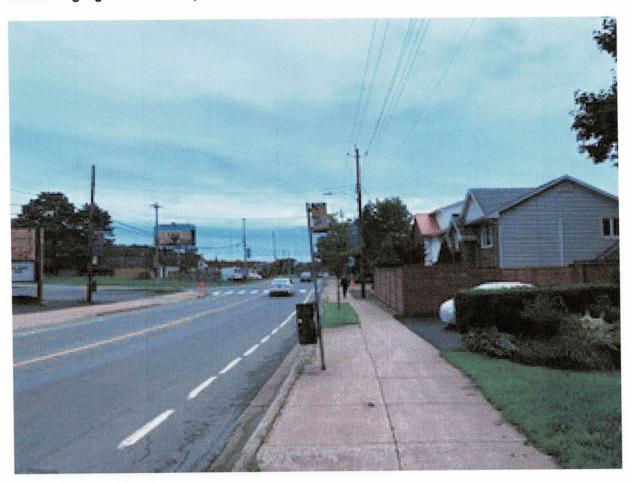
Site Access #4 Sight Line South of Access (Looking to the Right)
